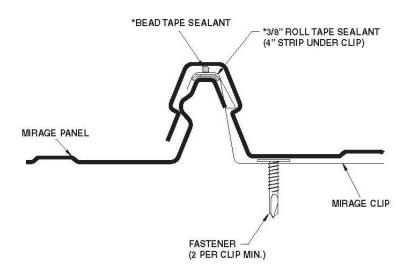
MIRAGE SIDE LAP DETAIL
